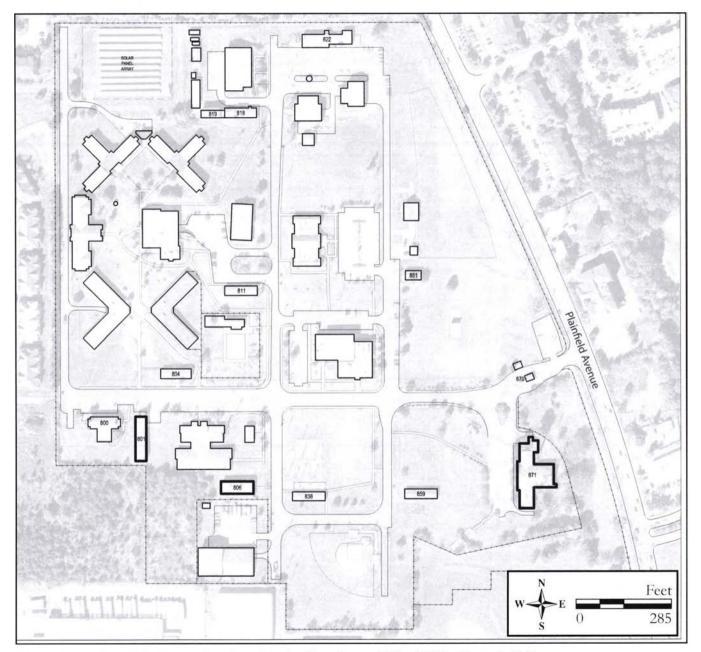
Edison Job Corps site plan, showing locations of World War II-era buildings.
